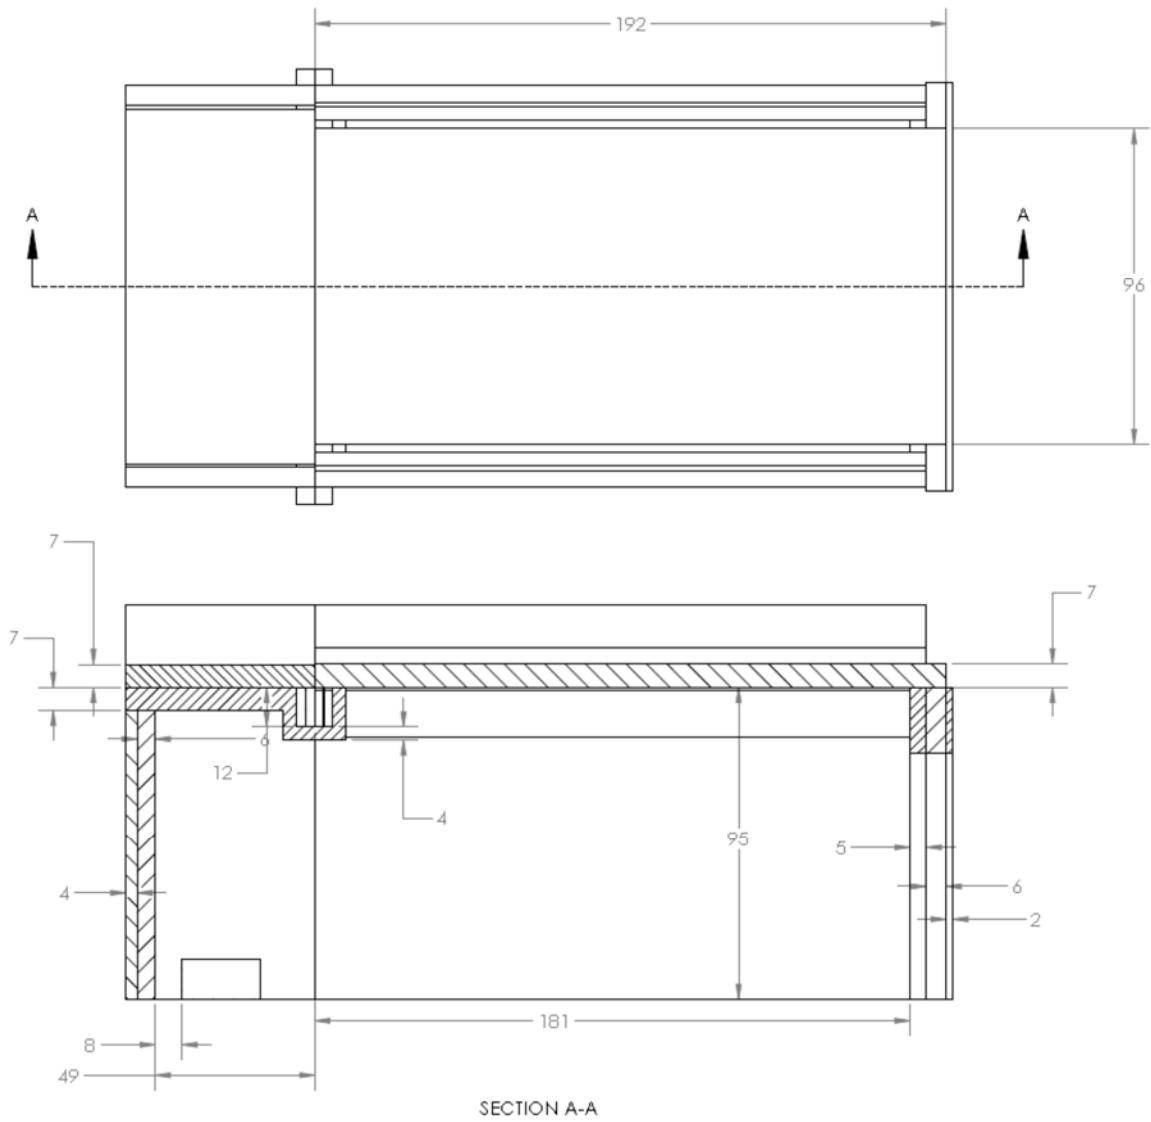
Plan View and Side Elevation (Section) of Test Room (Units in inches)
